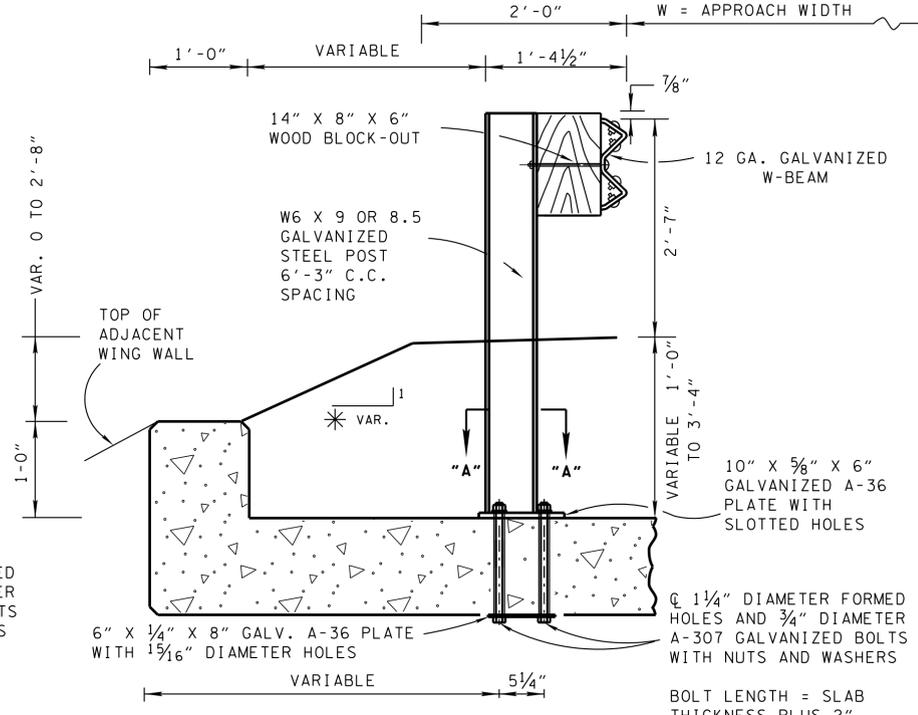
DETAIL FOR CONCRETE DECK USED AS A RIDING SURFACE
